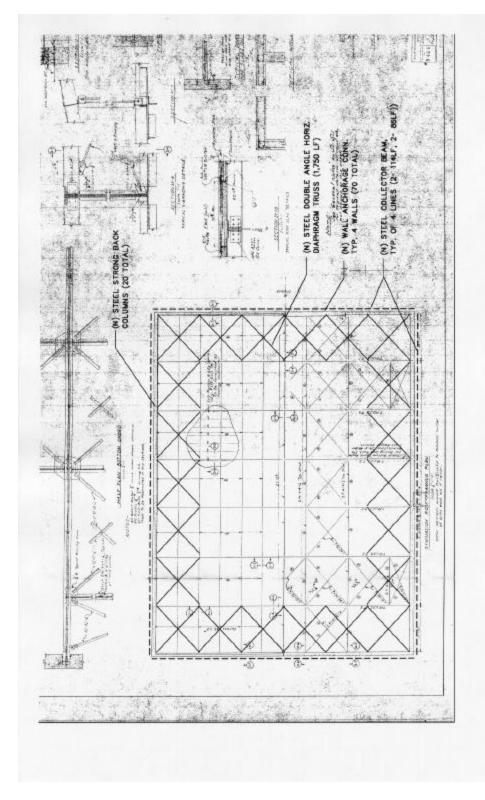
Main Building, Miscellaneous Roof Framing Plan
